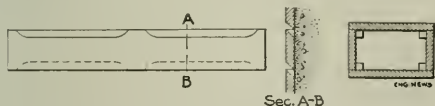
HORIZONTAL SHEETING FOR SINKING PITS
